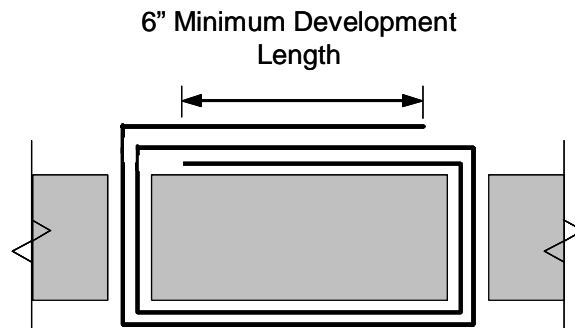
Connection Upgrade A4 CFRP Shear Stirrup Detail
